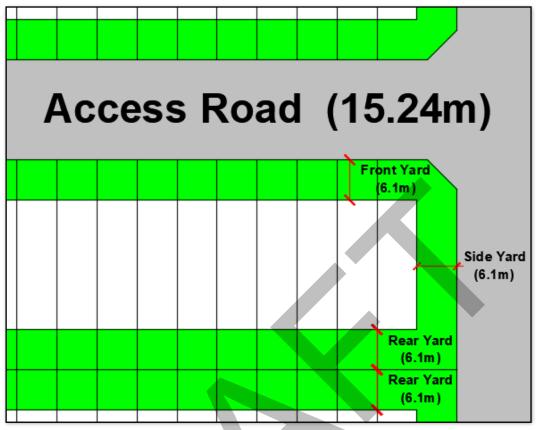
Minimum Setback for Terrace Dwelling Units.
